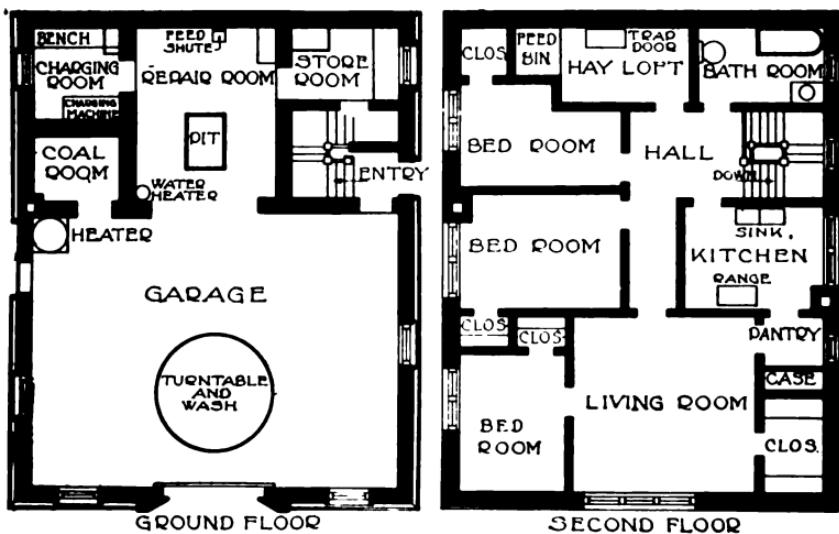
Floor Plans of Garage Shown in Fig. 23
